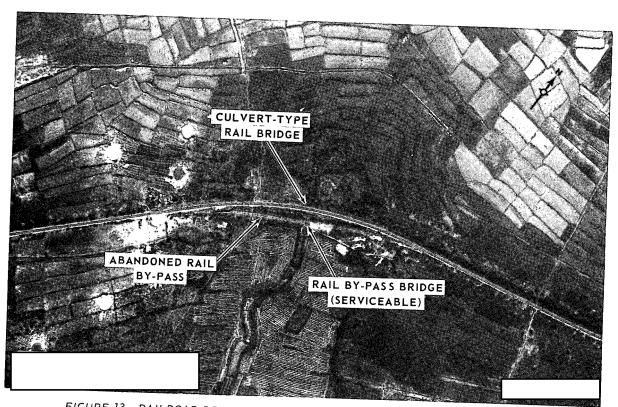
RAILROAD DRAINAGE DITCH CROSSINGS, TRANG MOI, NORTH VIETNAM
